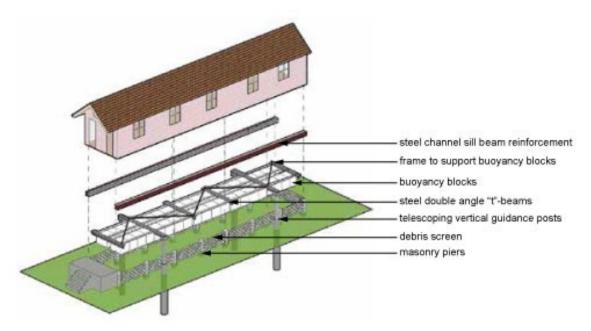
Buoyant foundation schematic diagram (photo credit: Buoyant Foundation Project)
